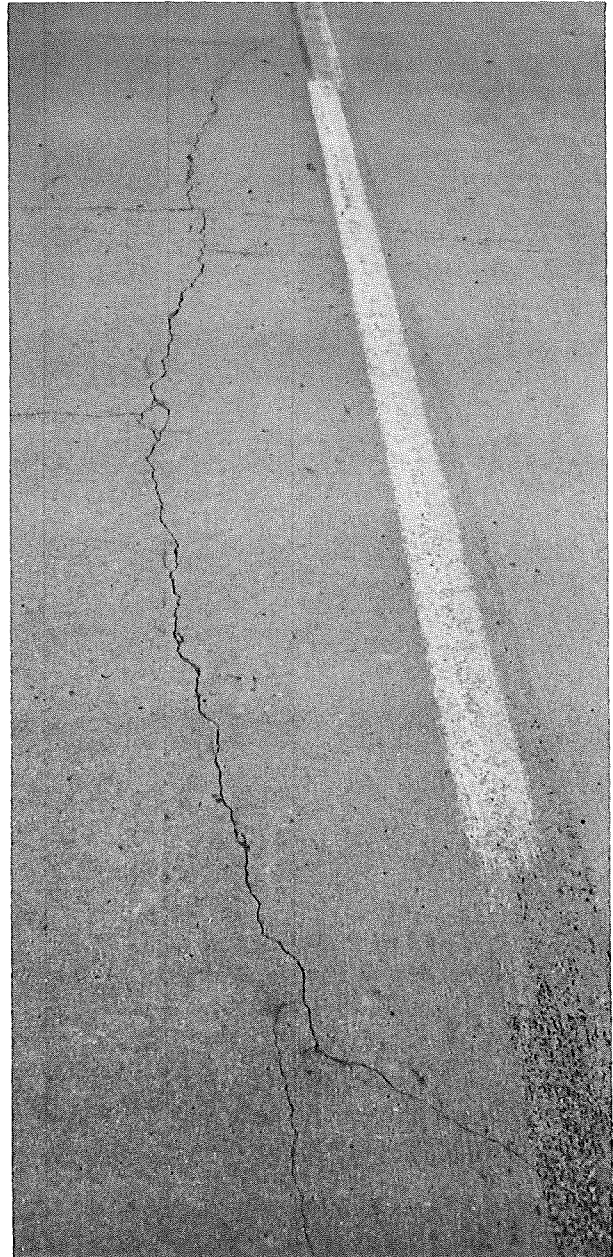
Random longitudinal cracking in continuously reinforced concrete pavement on I 80, Illinois.
